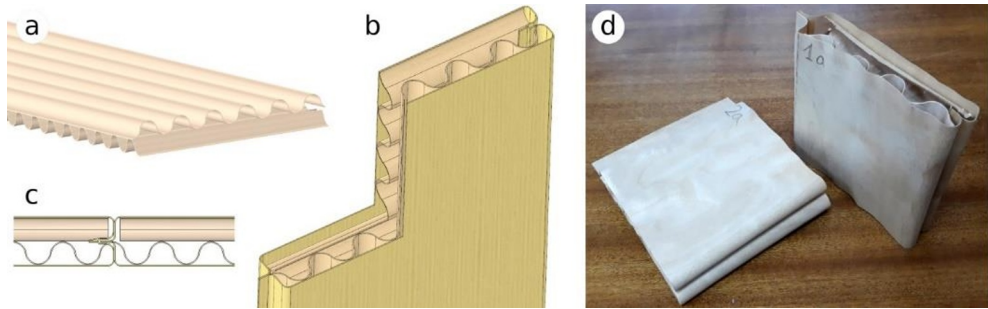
Corrugated wood veneer panel: a – corrugated veneer; b – 3D model; c – panel connection; d – prototypes (picture and photo by the authors).
